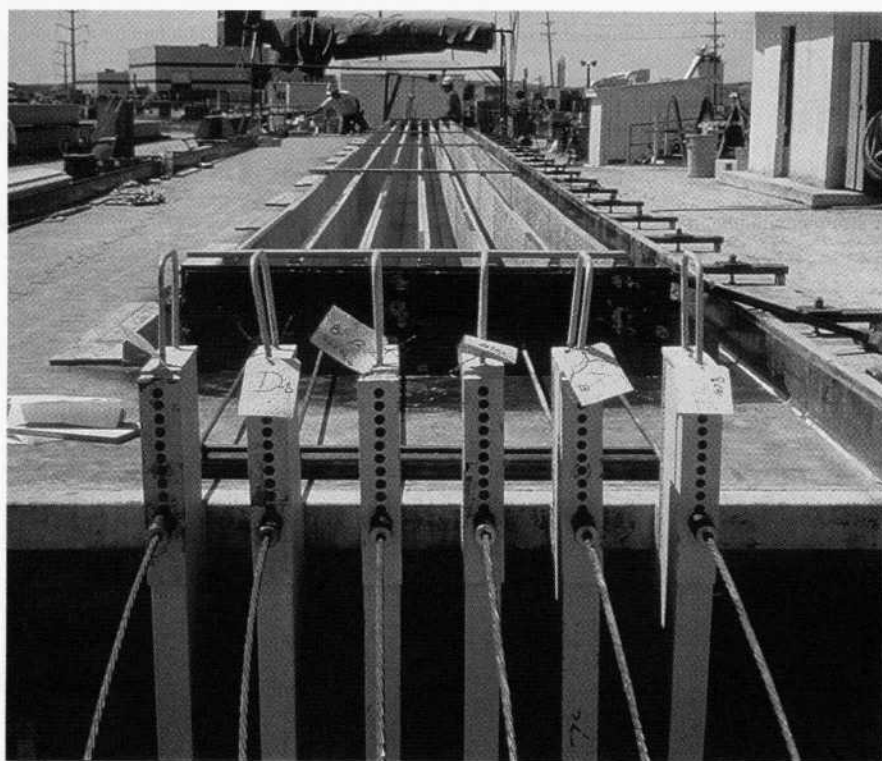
Beam test specimens. Six strand specimens after prestressing (May 17, 1996).
